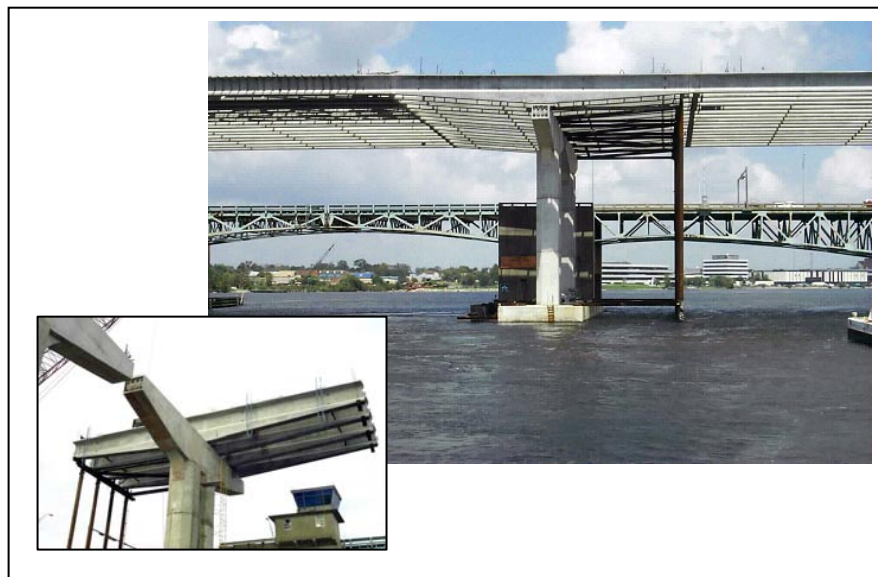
Spliced I-Girder Construction (spans 100 to 250 feet)
